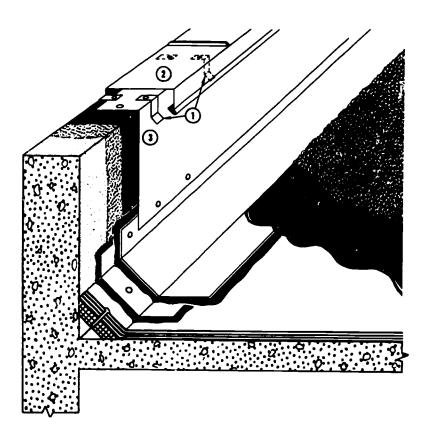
Metal counterflashing and stucco stop for wood frame and stucco walls
